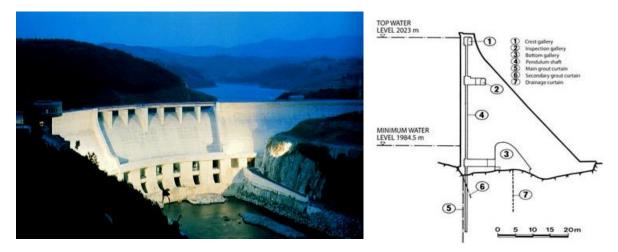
Villerest gravity dam (left) (photo EDF) and a typical gravity dam section (right)
